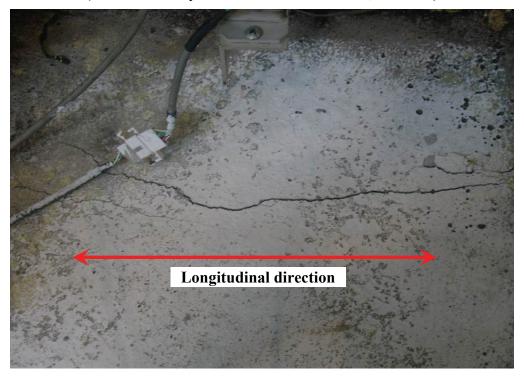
Propagation of the Crack in Intermediate Concrete Slab (Photo Courtesy of C.H.Lin and K.C.Tsai, NCREE)
